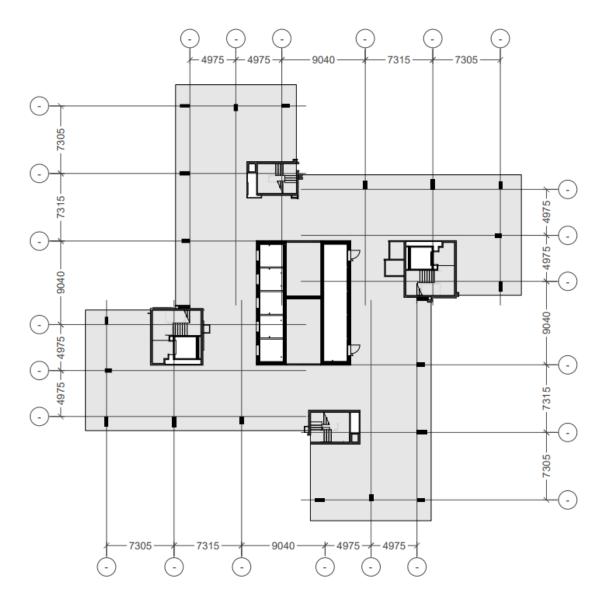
Typical existing office floorplates for tower Level 20 to 34
